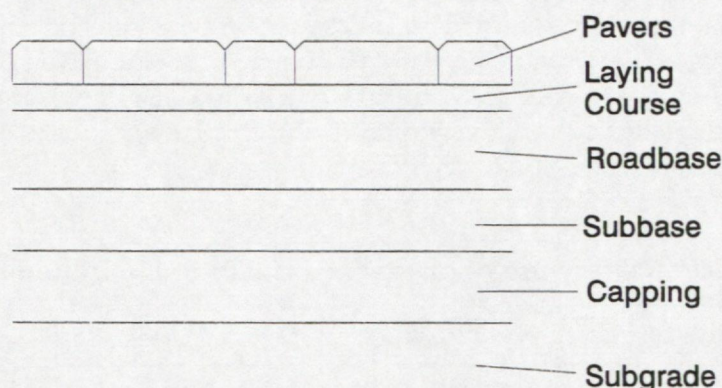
Cross section of Paver Pavement. Some of the courses may be absent – the capping is provided on poor subgrades only.
